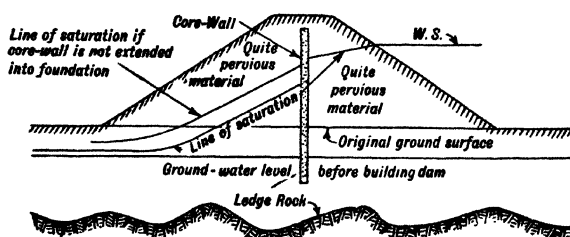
Showing the Effect of Extending the Core-wall into a Pervious Foundation.
